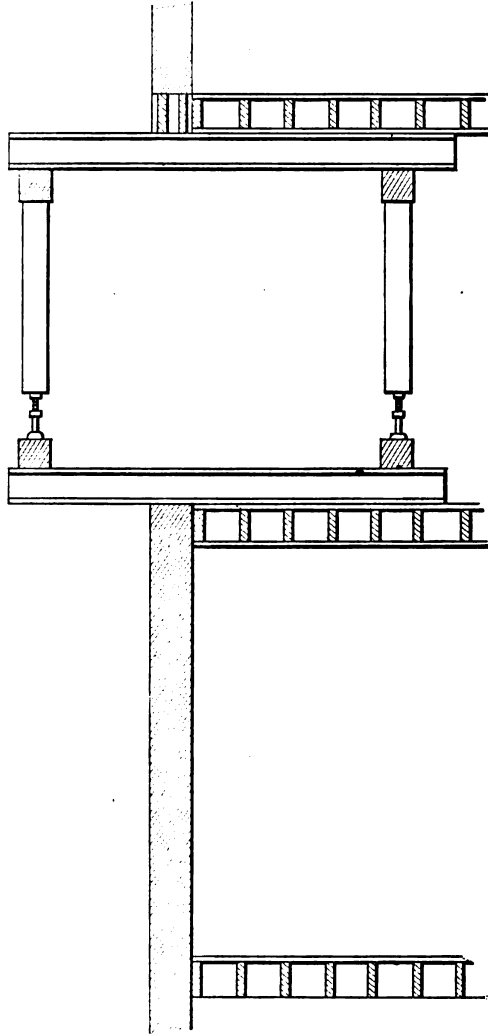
Vertical Cross Section of Building Showing Front of Sixth Story Taken Out and the Upper Stories Supported by Means of Jack Screws.
